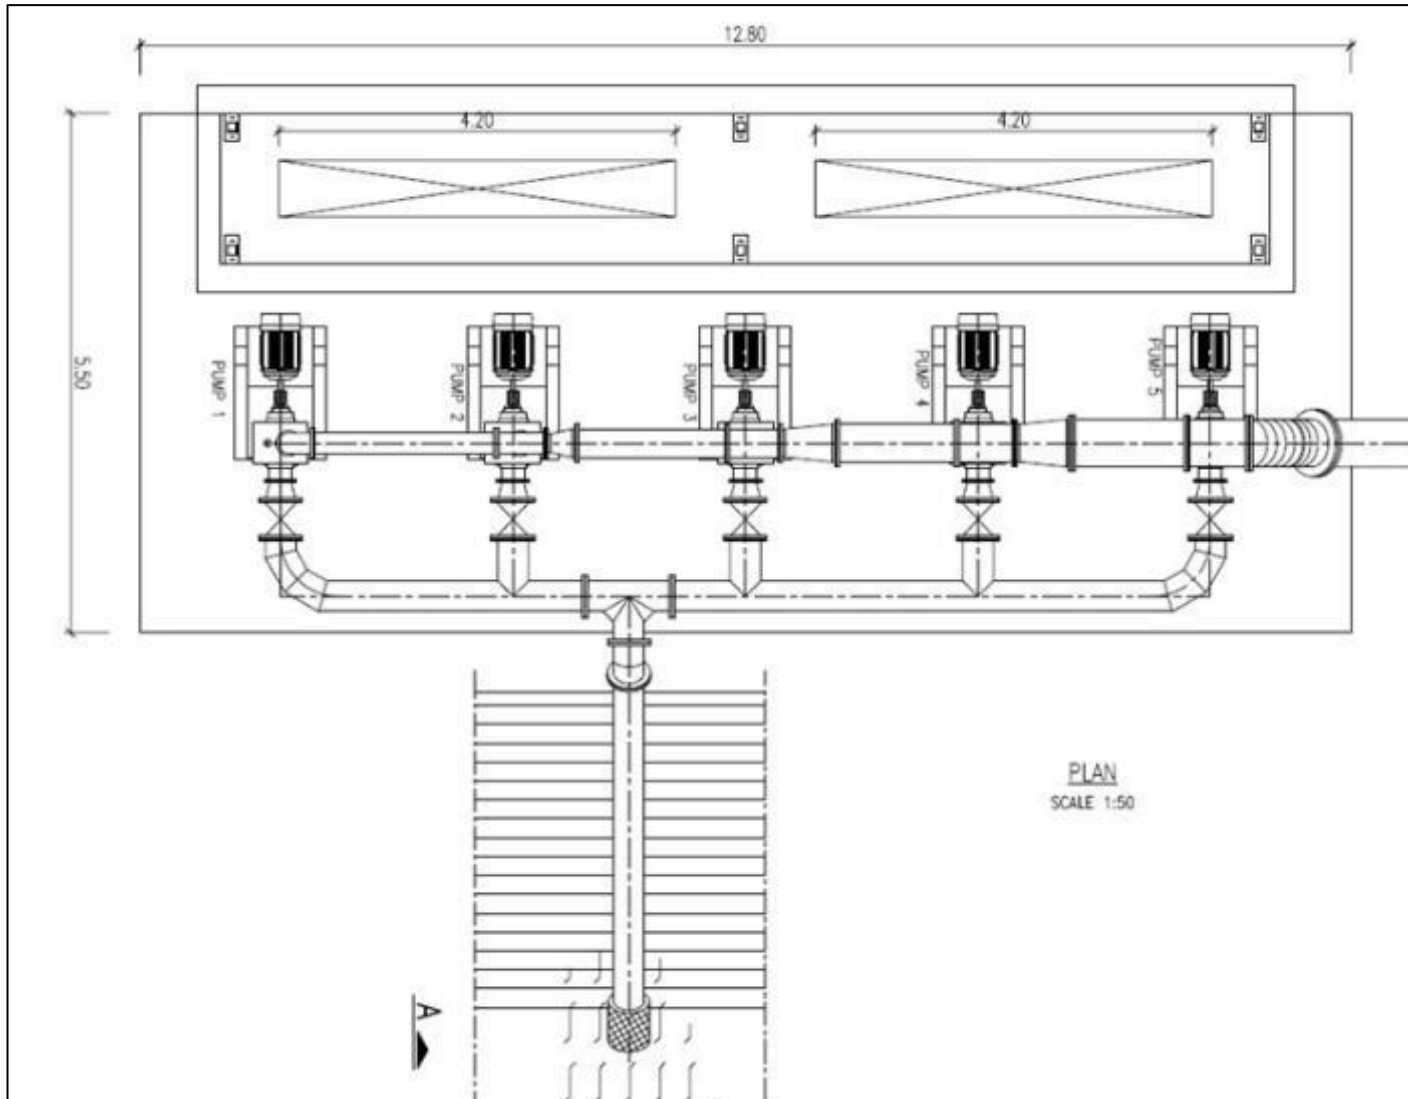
Typical pump station layout (with only a single suction pipe)
